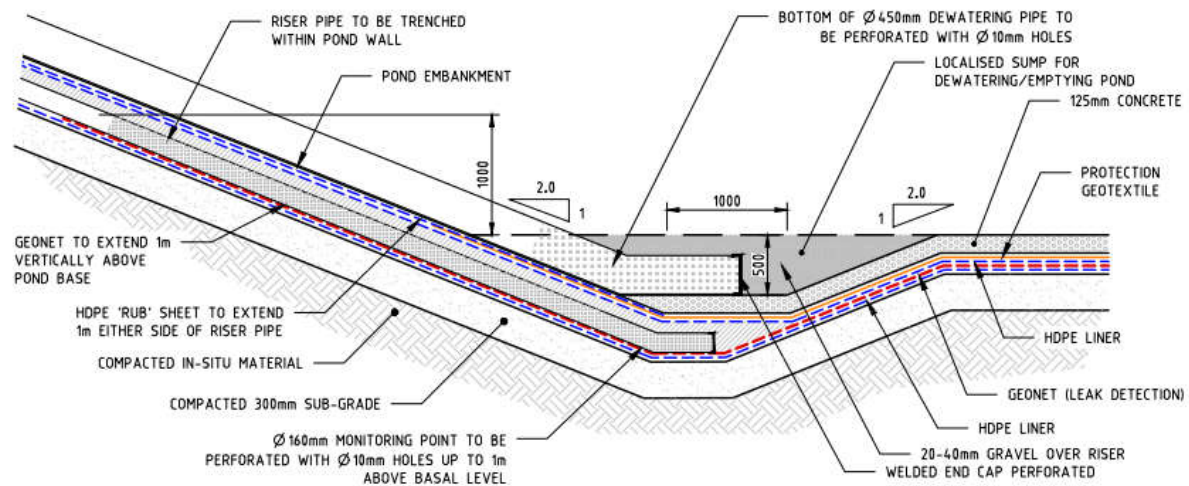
Tim's Thicket Septage Facility – proposed layout of upgraded pond arrangement
